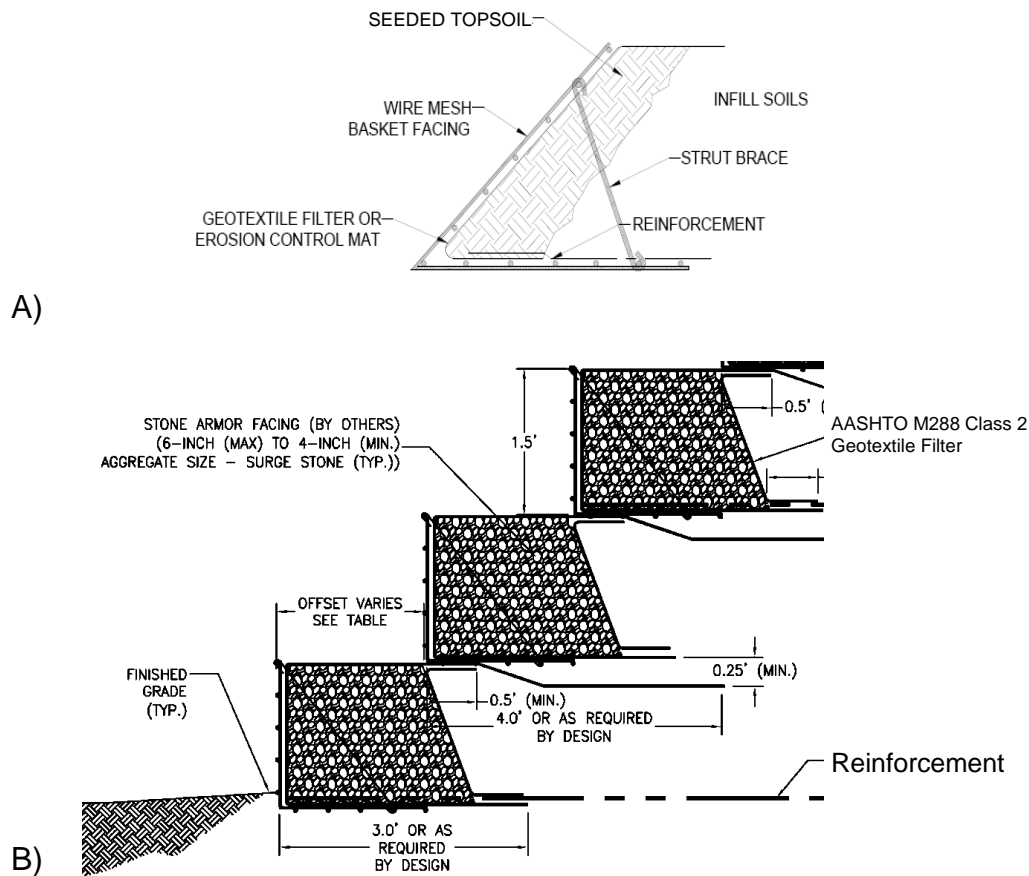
Example of welded wire mesh detail for temporary (during construction) or permanent face support showing a) smooth inclined face, and b) stepped face.
